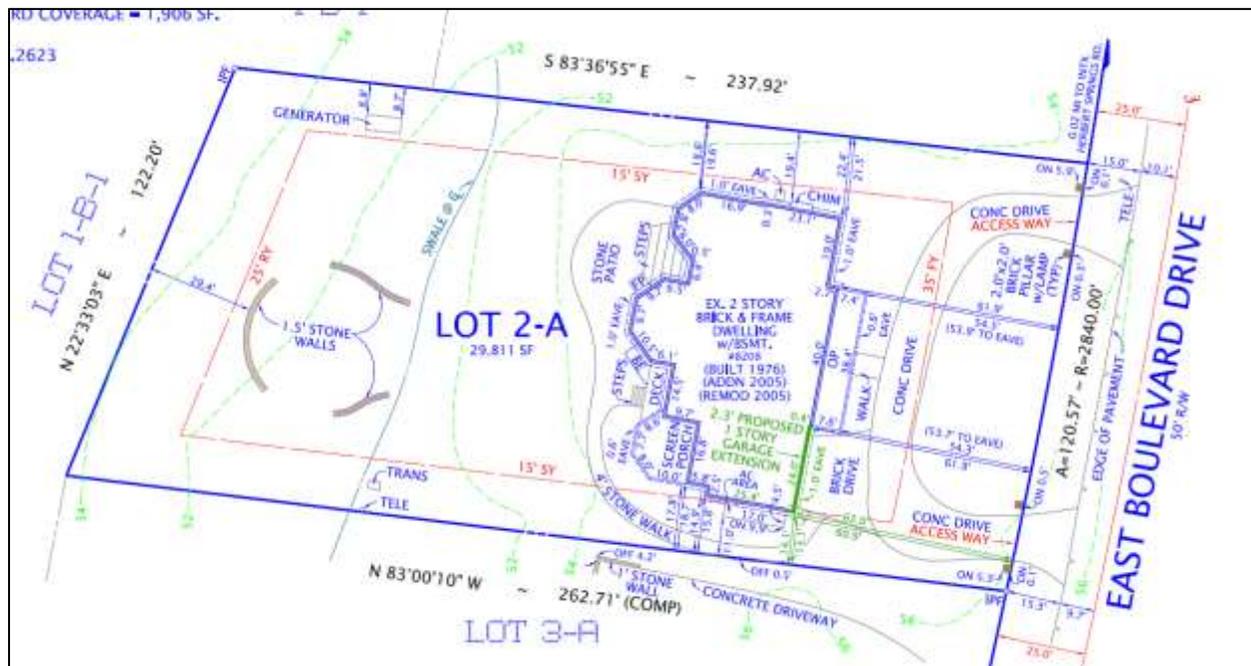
The site design shown on the SP Plat (Source: Dominion Surveyors, Inc., 9/6/2014)
